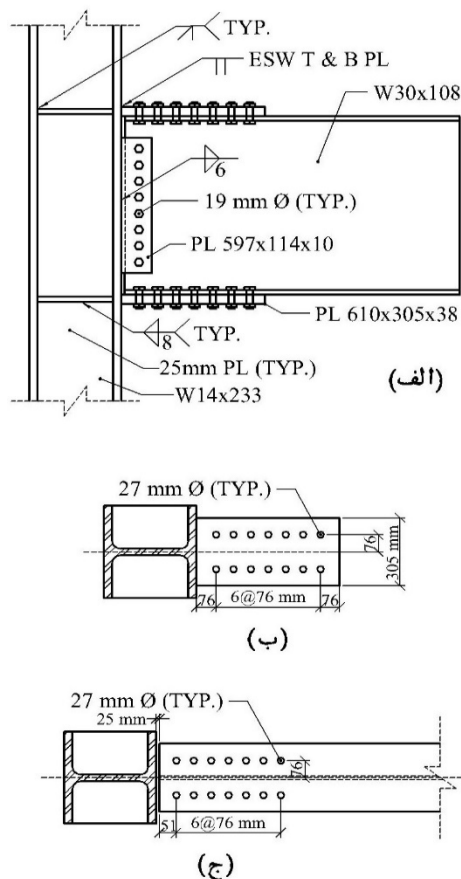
Details of experimental specimen, (a) Connection view, (b) Top and Bottom plates, (c) Beam flange [5]
